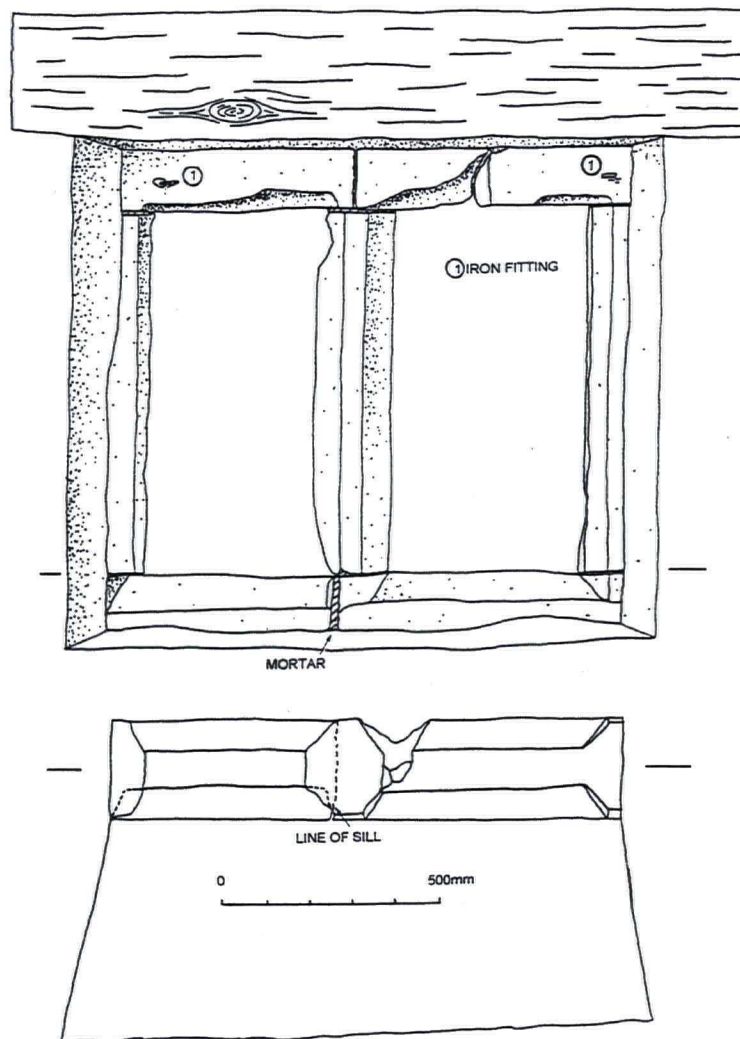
Elevational and sectional drawing of the two light mullioned window
